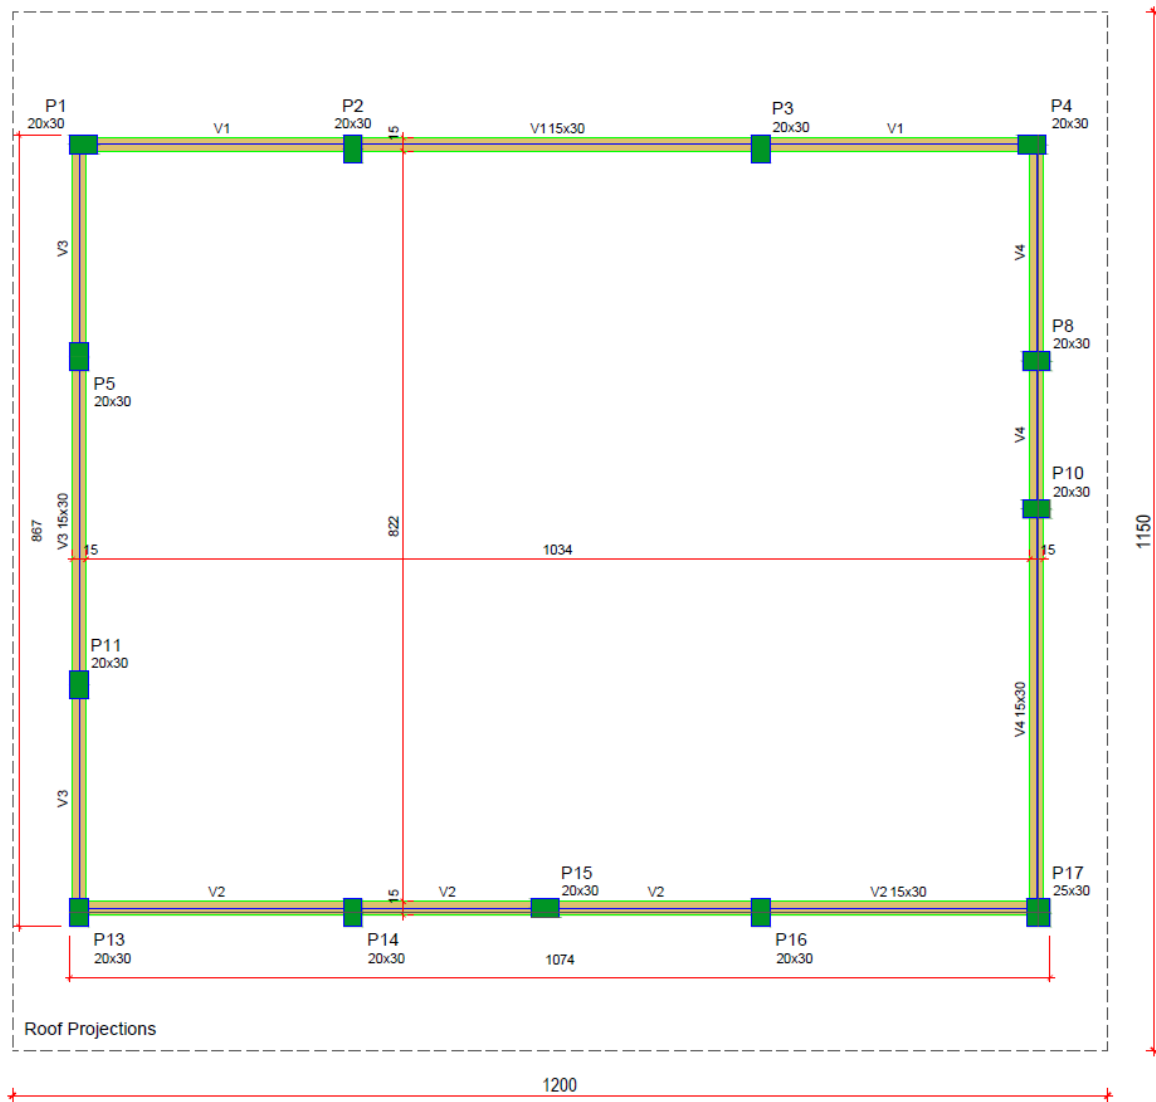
Roof deck formwork and roof projection (dimensions in cm)
